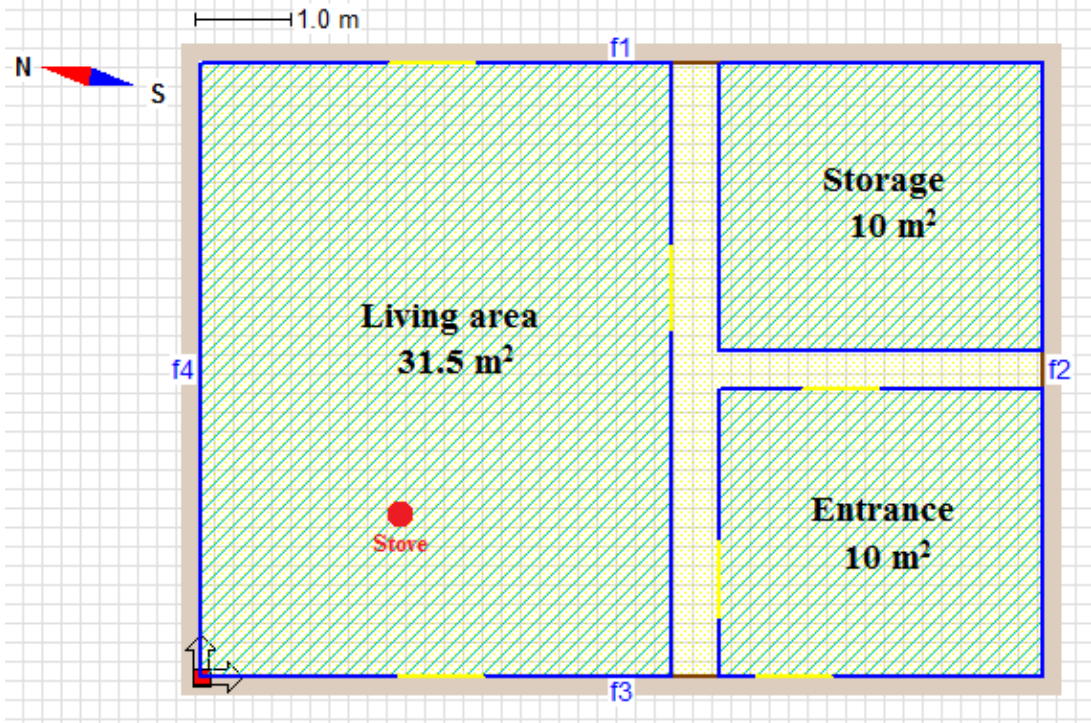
Floor plan for the mud-bonded stone house in Ghorepani.
